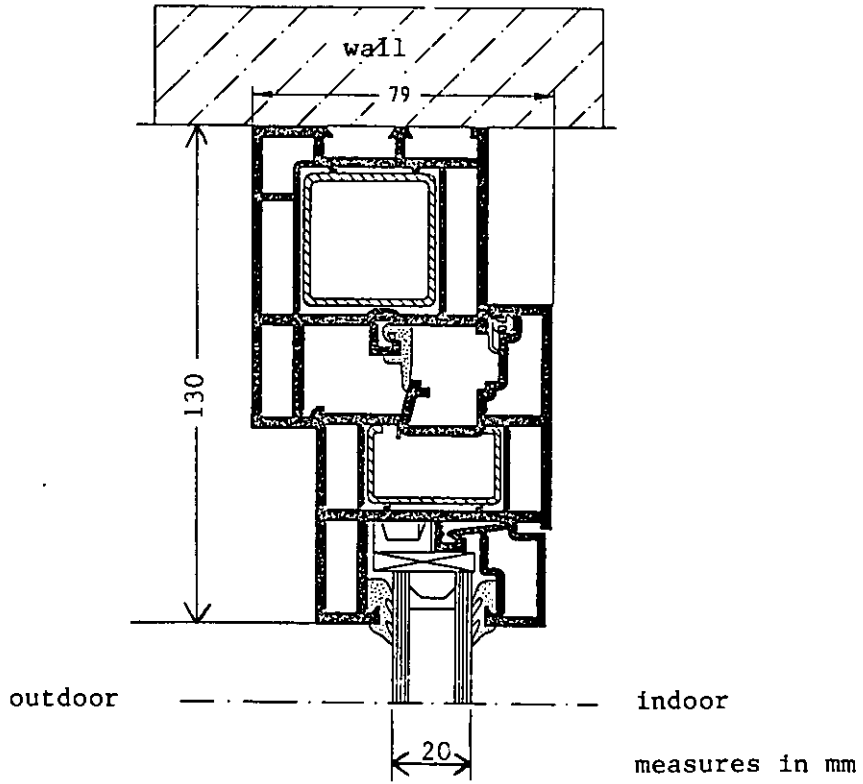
Example of PVC frame with steel reinforcements ([5]).
